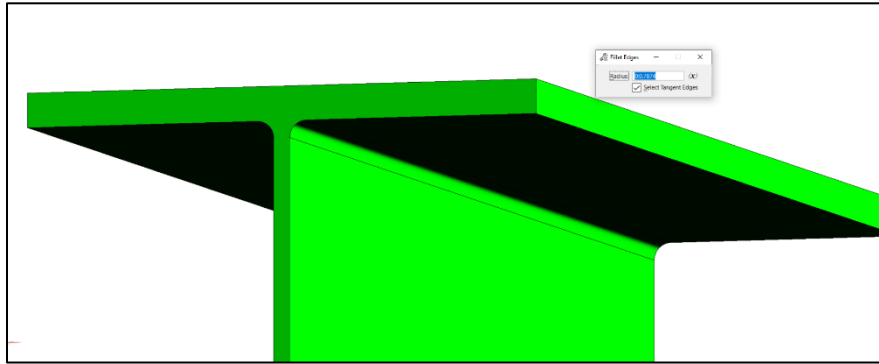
Using the fillet tool to round the corners of steel shapes
